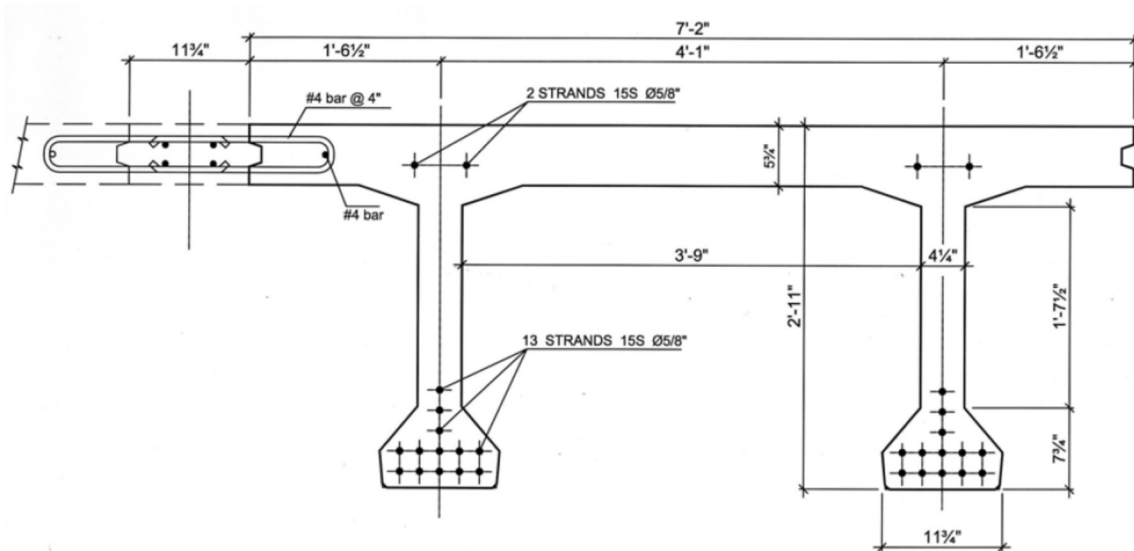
Cross Section of the UHPC Girder of Bourg-les Valence Bridge (Hajar et al., 2003)
